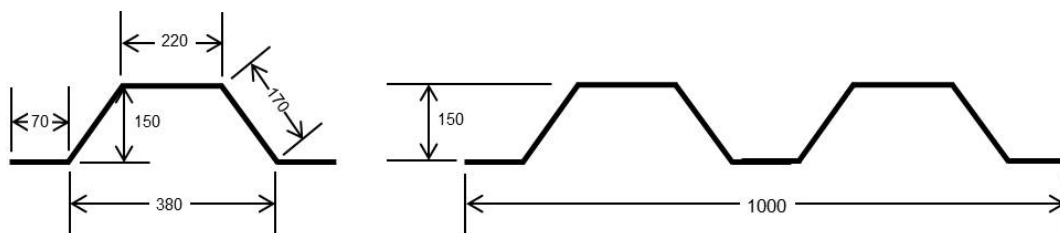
Dimensions of the steel sheet (unit: millimeters)
